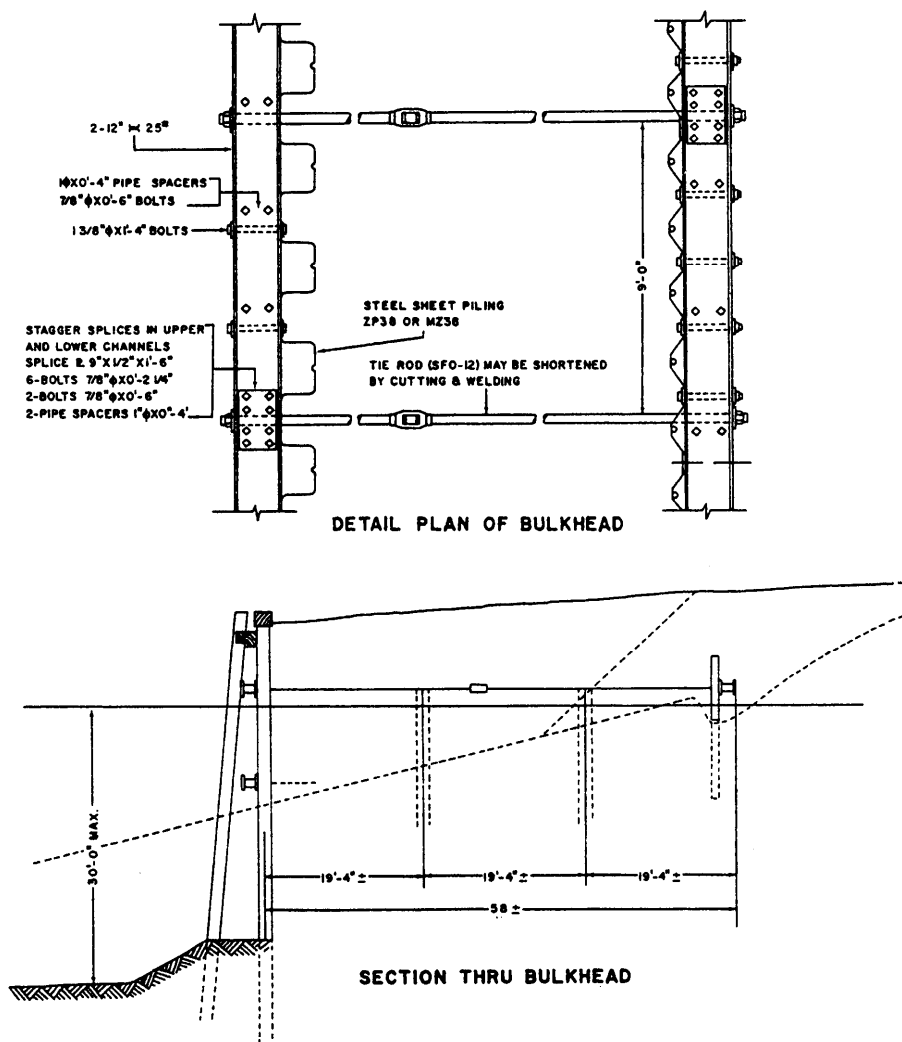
Working drawings for steel sheet-pile bulkhead.
